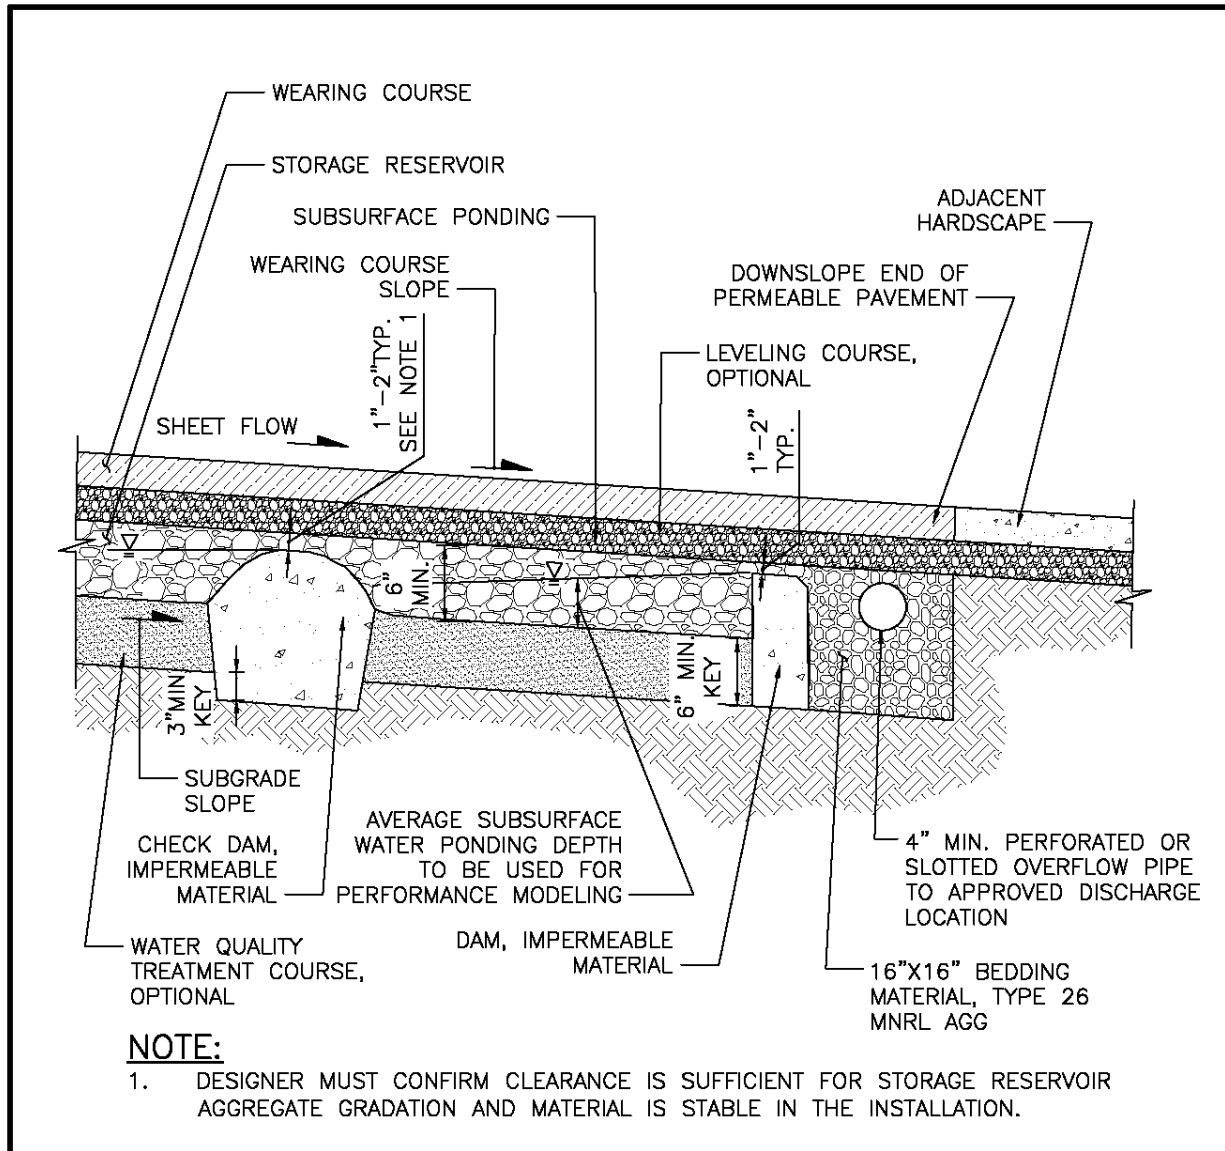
Example Permeable Pavement Facility with Checkdams.
